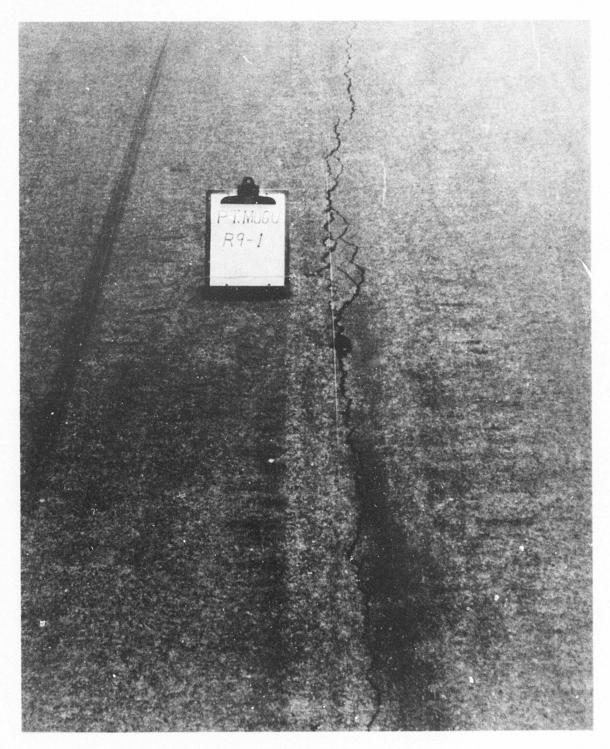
Unsealed longitudinal construction joint crack, discrete area R9-1.
